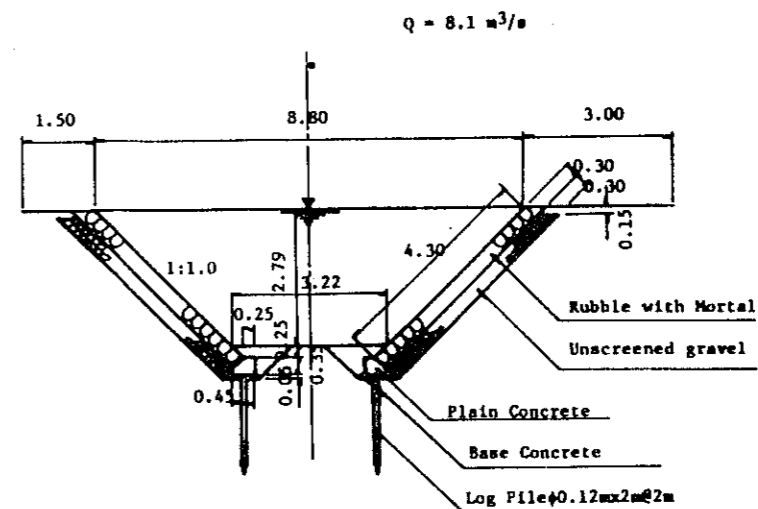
(1) STANDARD STRUCTURE OF DRAINAGE CHANNEL (URGENT PLAN)
